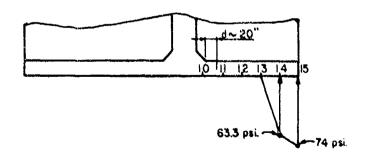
Example C.2: Locations of soil elements on foundation and design loadings.
